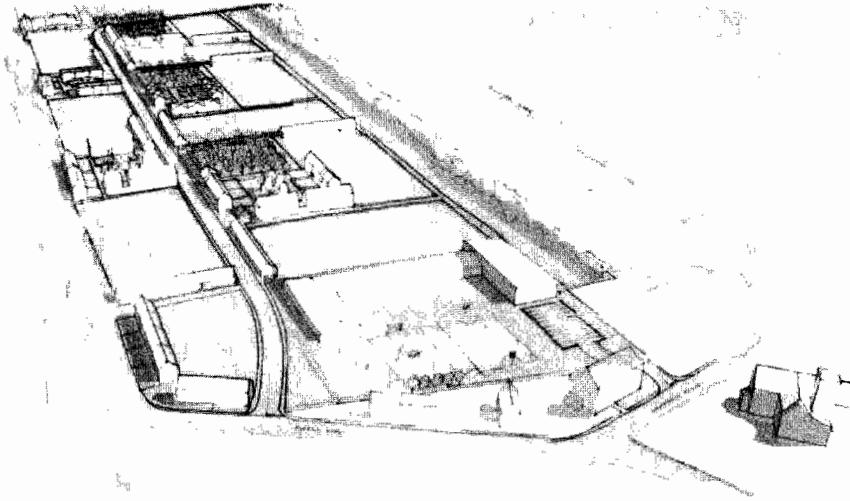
Scenario 4: Croft. Master plan, aerial view.
